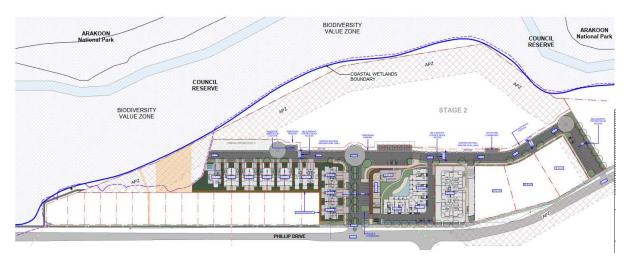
Proposed Stage 1 Site Plan (Rise Projects)
